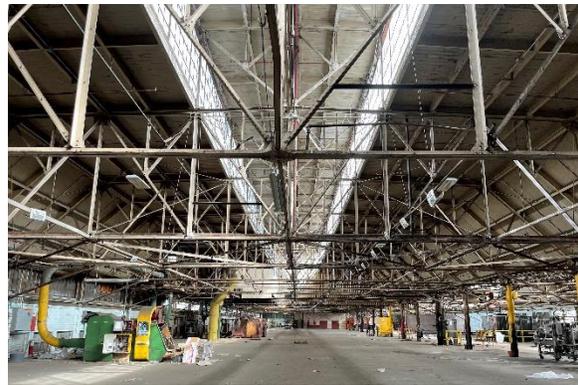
Building 12, interior of main volume, second floor, view northeast.
